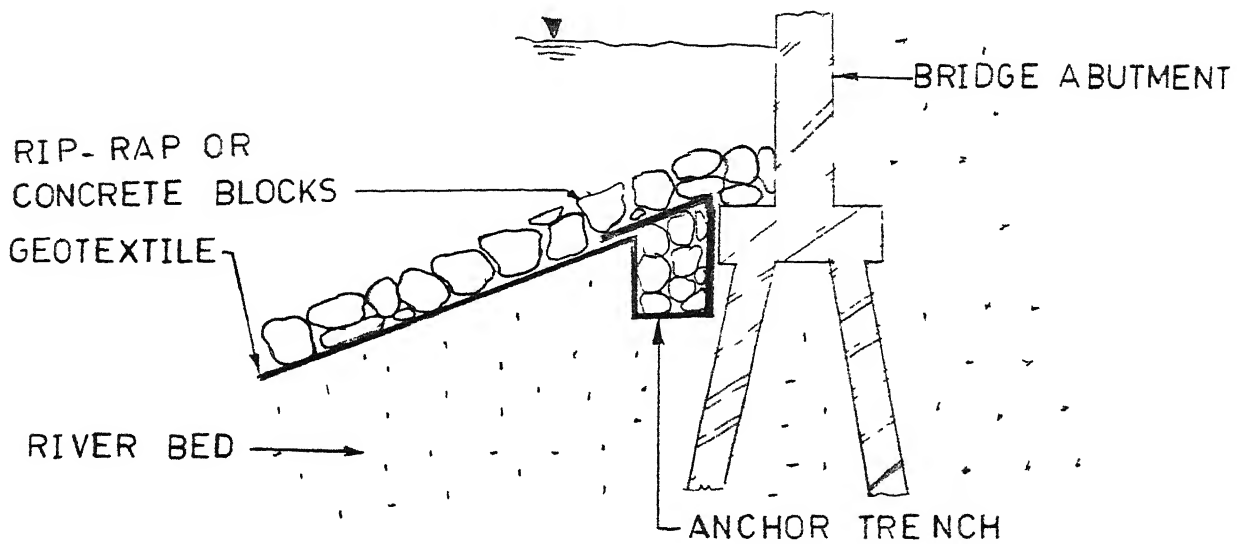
SCOUR PROTECTION FOR BRIDGE ABUTMENT
